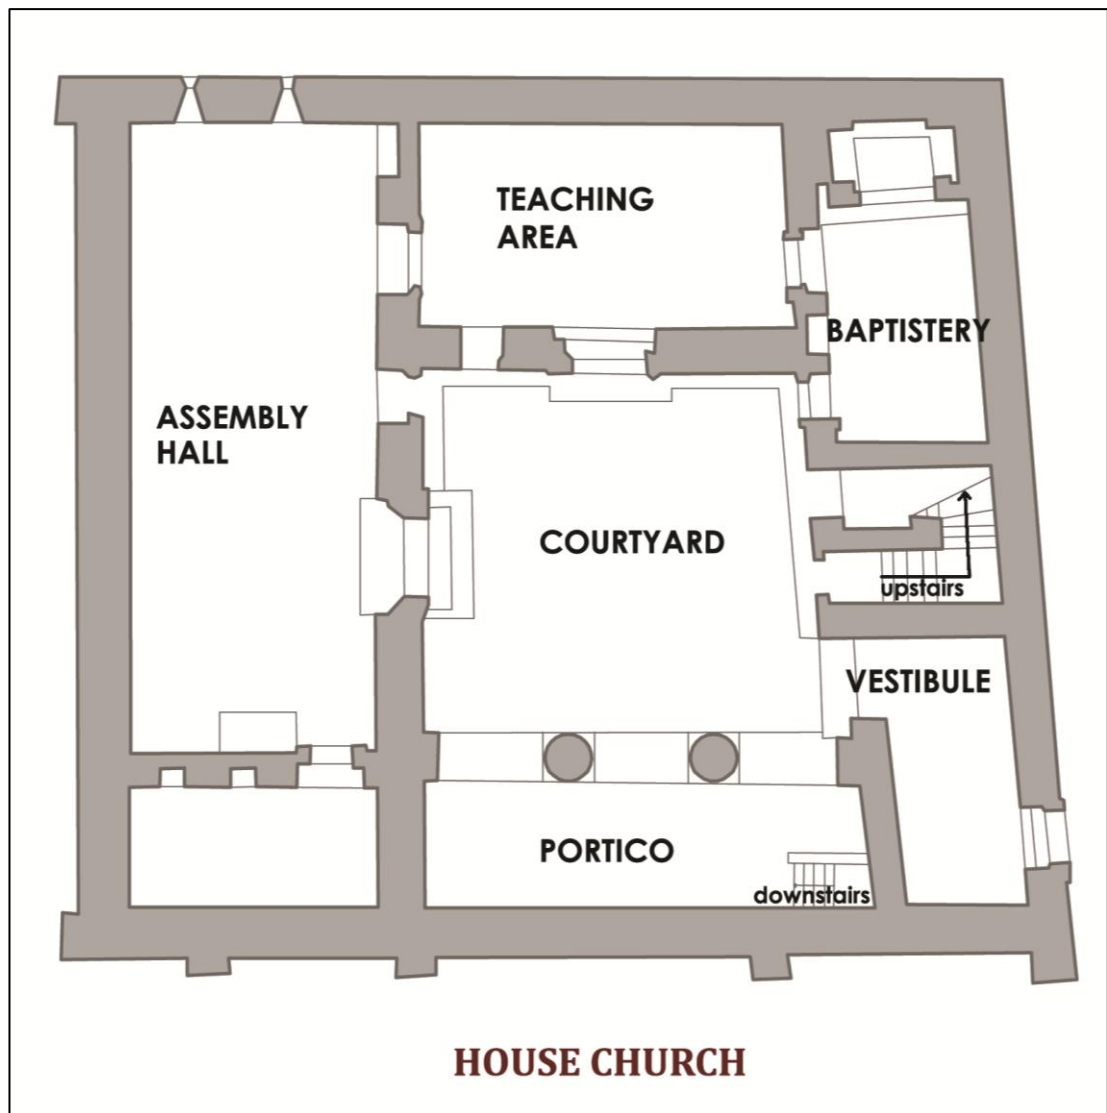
The plan demonstrating the conversion to the House-Church (after Kraeling, 1967, p. 35)
